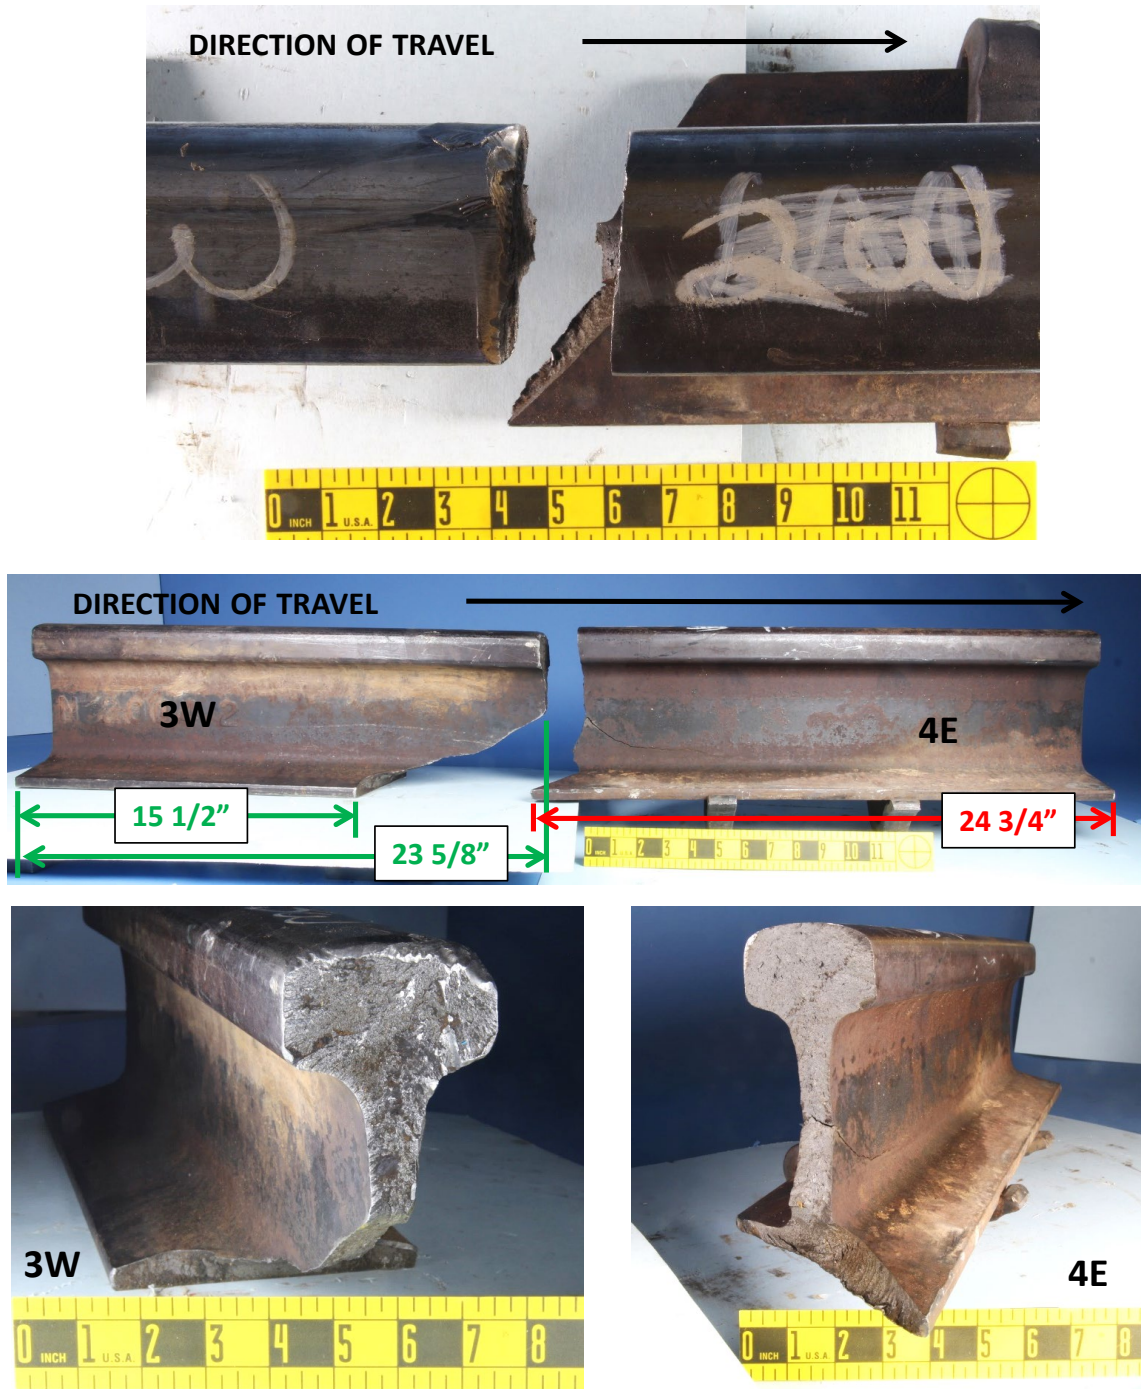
Macro and close-up photos showing how pieces 3W and 4E mated as viewed from the field side. Various measurements of the pieces are listed.
